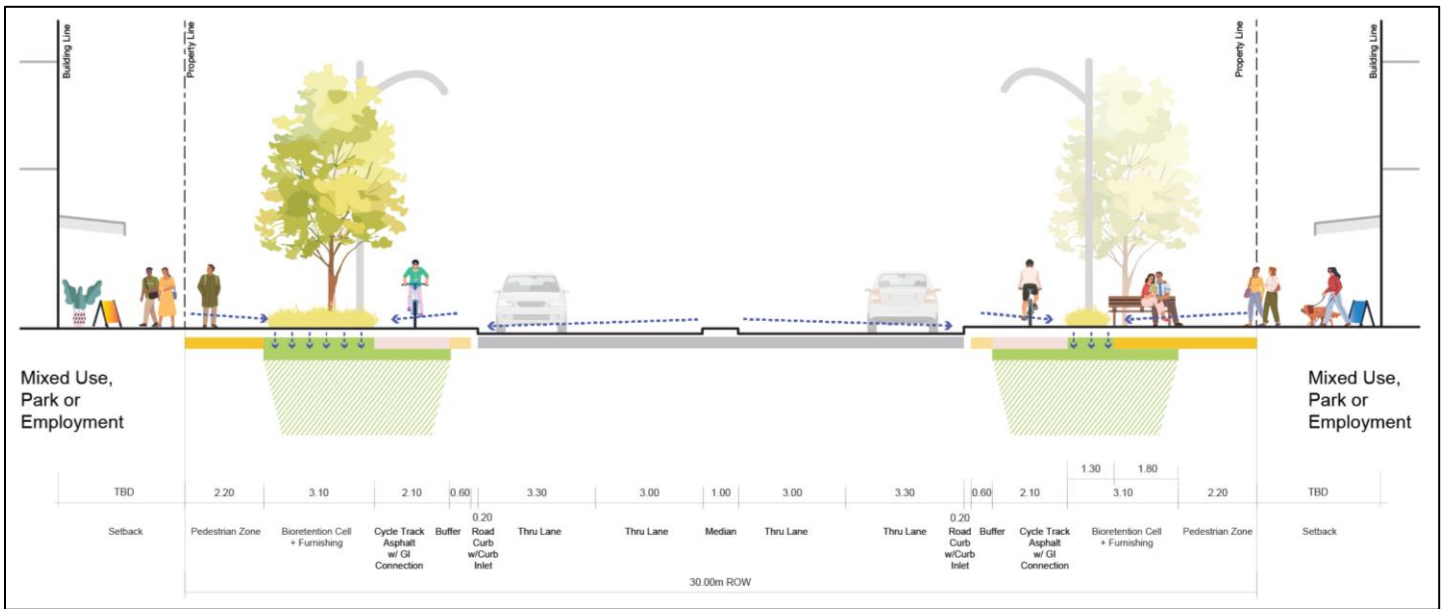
Northern Street (Sheppard Avenue West to Billy Bishop Way) Cross-Section – Option 4
